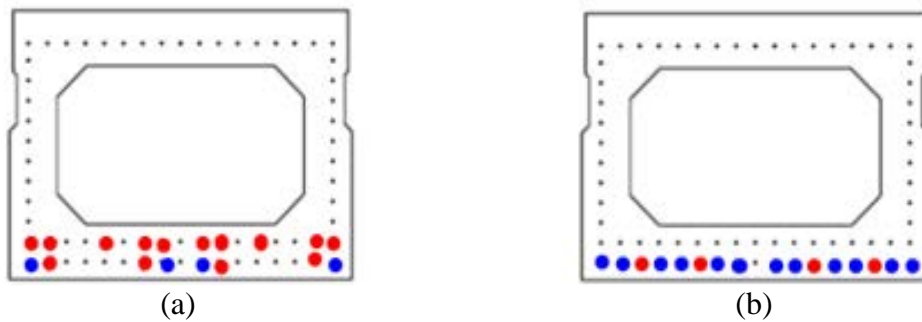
Strand configuration in (a) interior and (b) exterior box beam of Bridge 7722 determined with Ferrosan.
